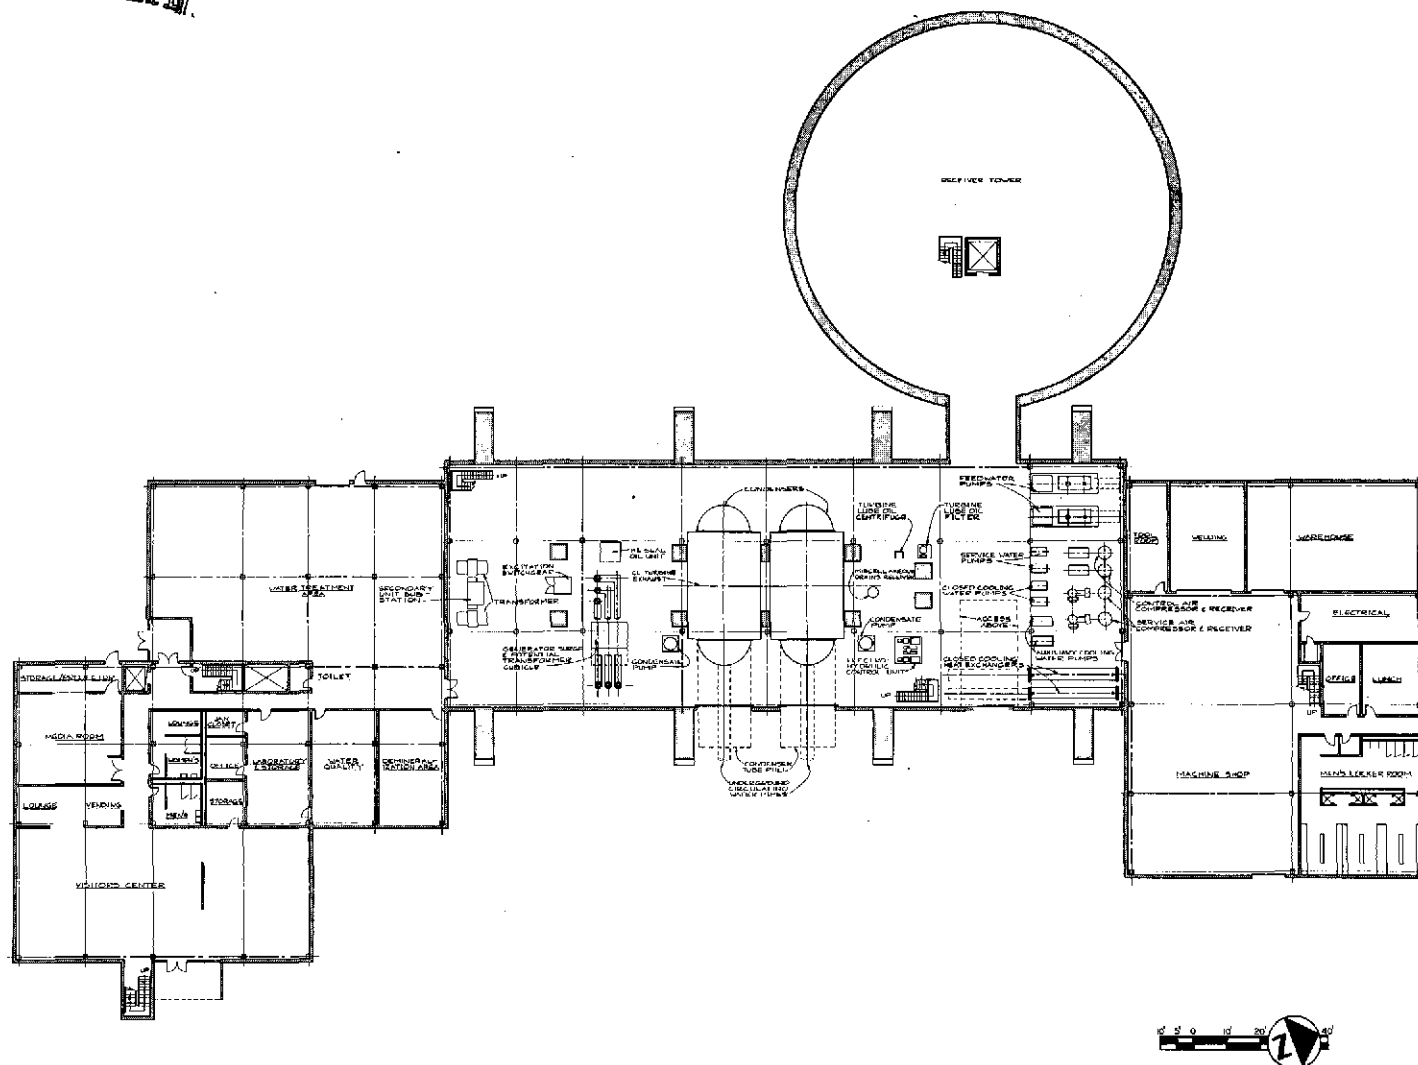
Ground Floor Plan Reference Central Receiver Plant
